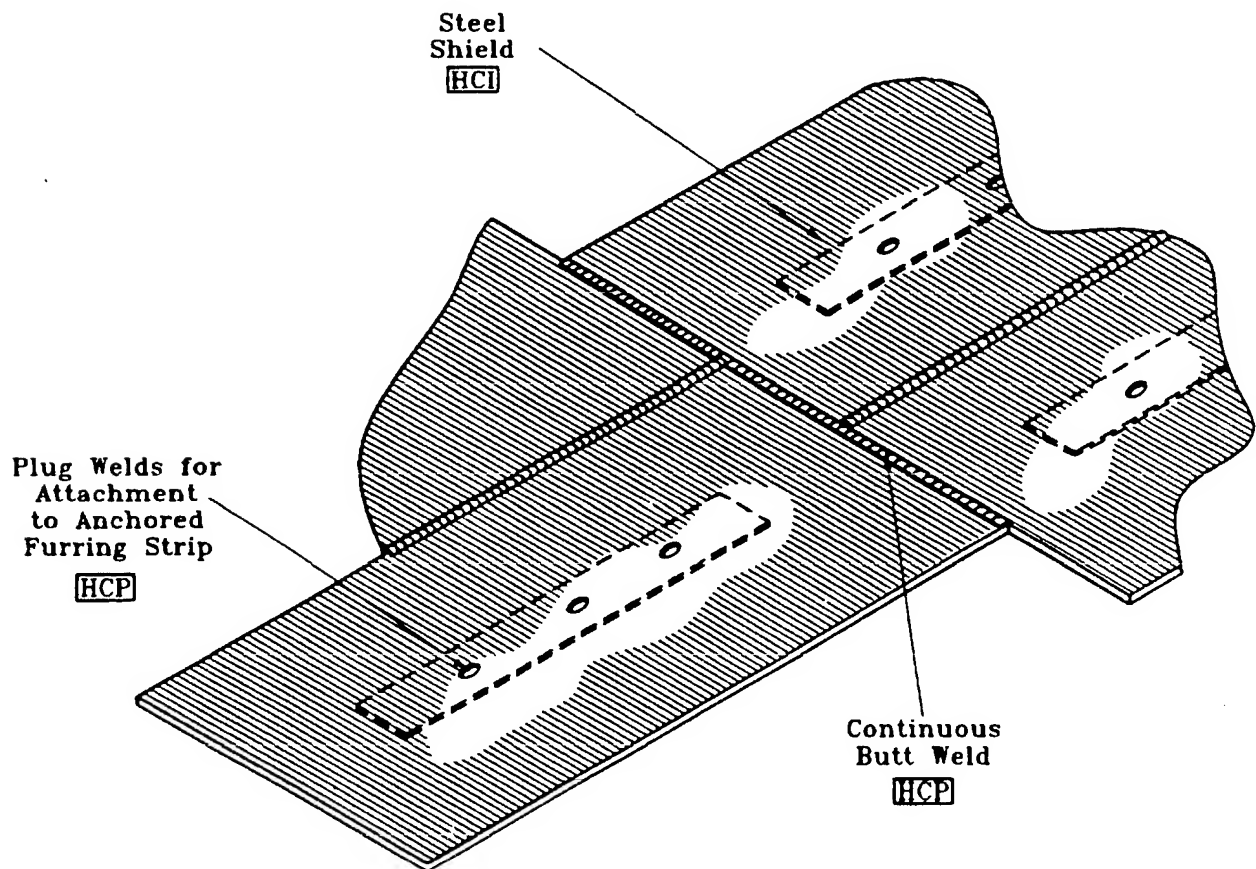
Butt-welded shield seam with plug welds.
